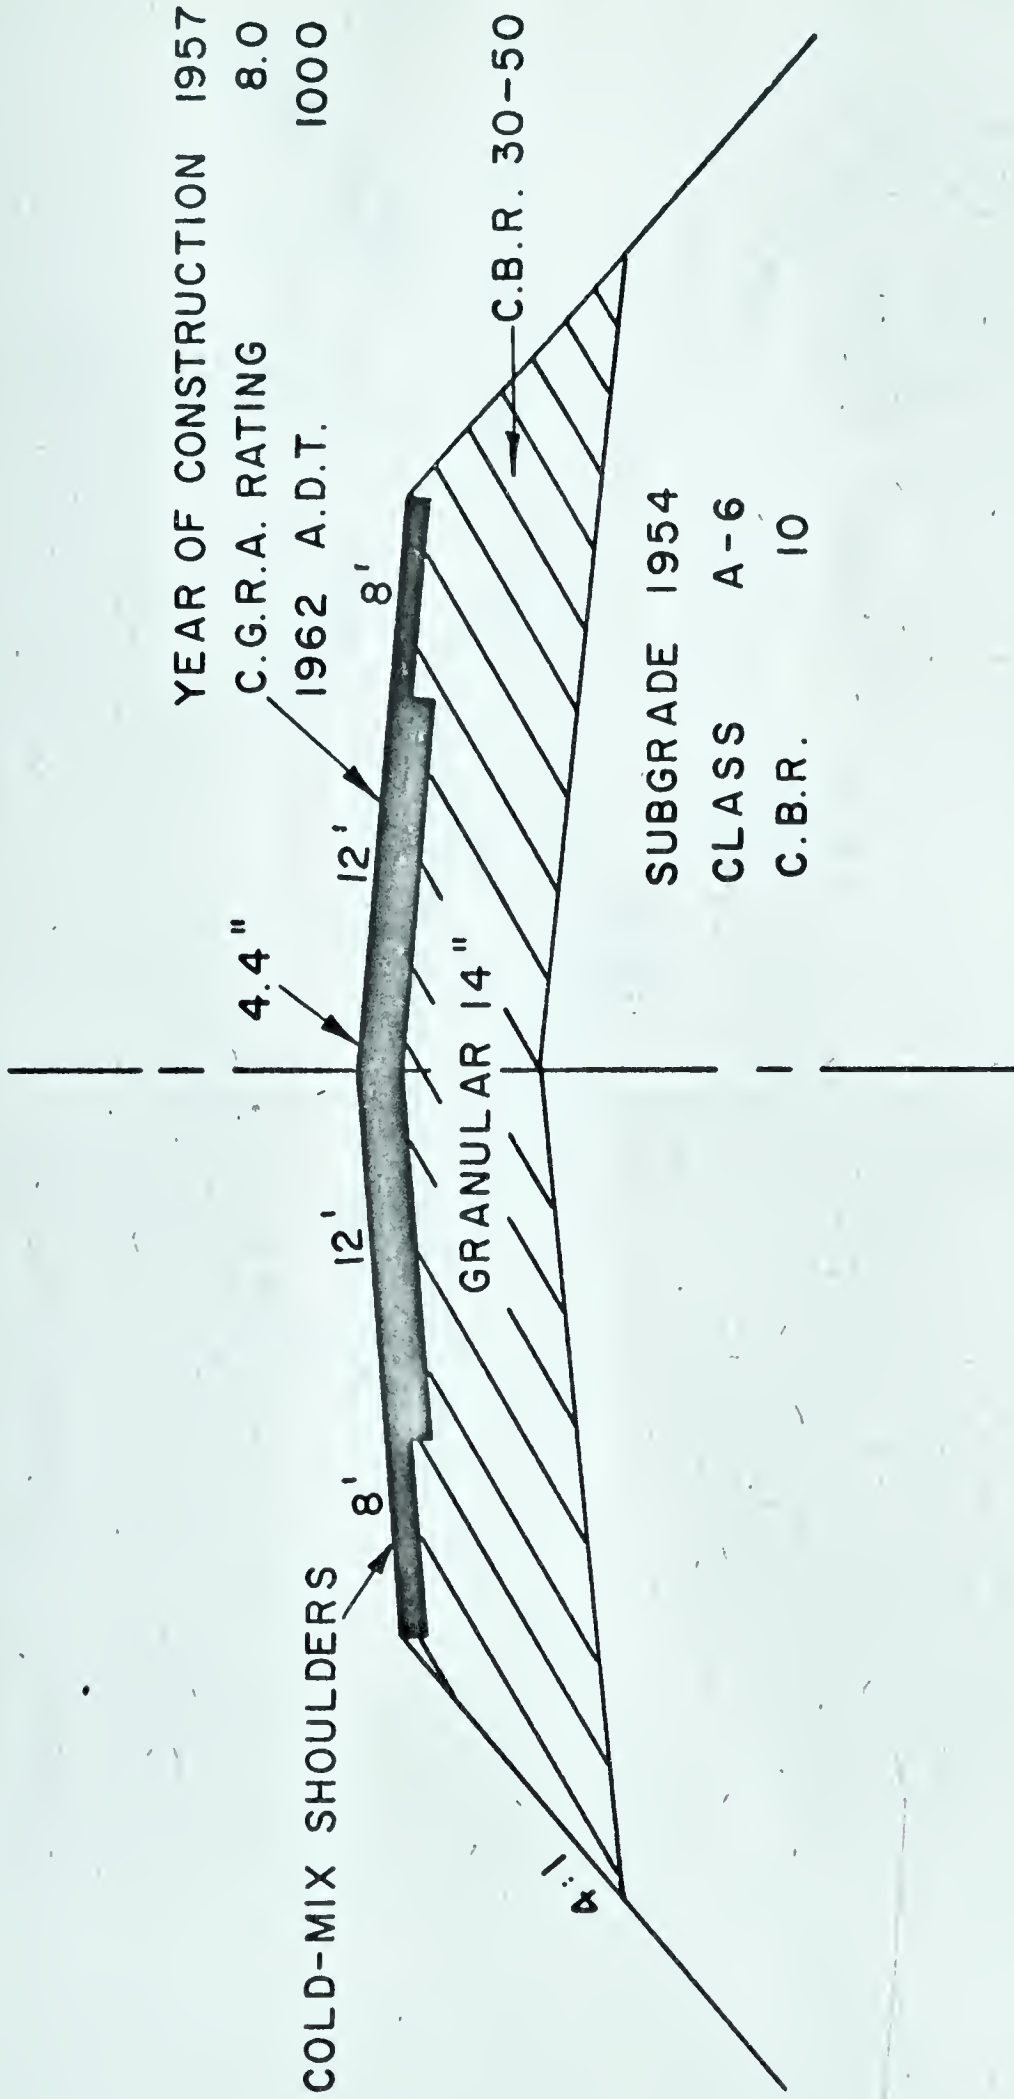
TYPICAL CROSS-SECTION, CONVENTIONAL SYSTEM
